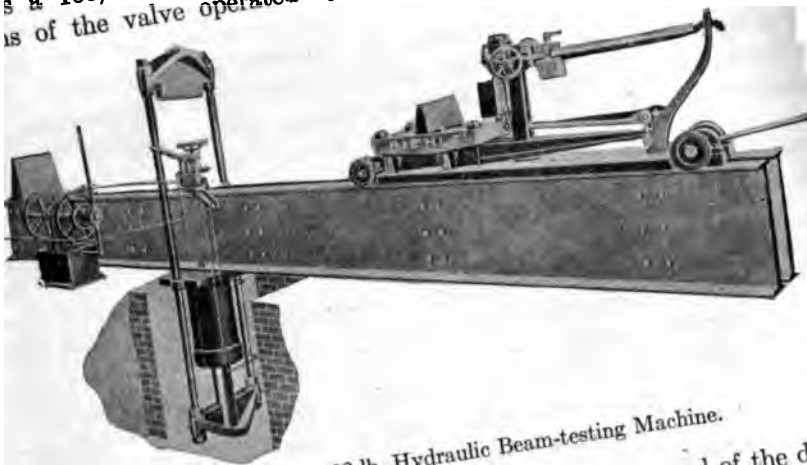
A 100,000-lb. Hydraulic Beam-testing Machine.
